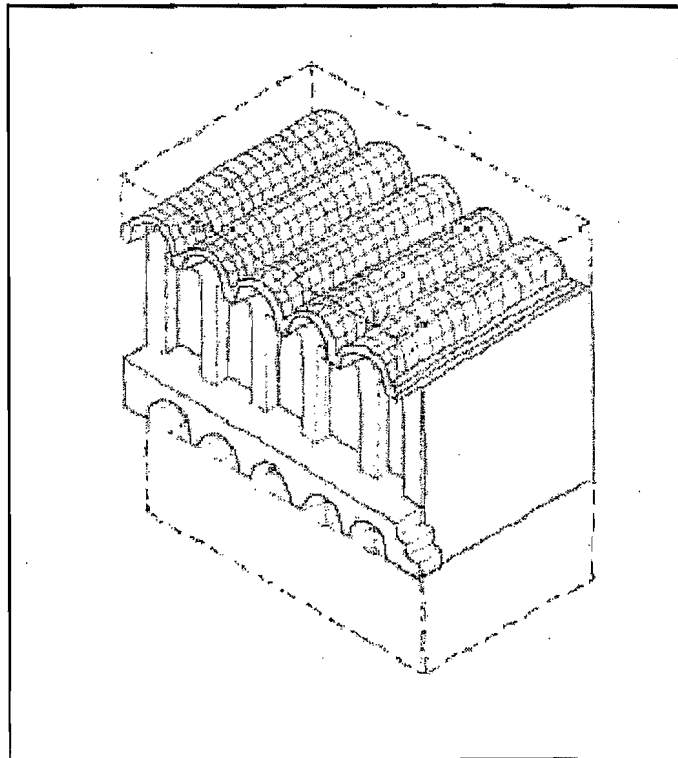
Sketch of curved-roof construction (multiple vaults).⁷³
